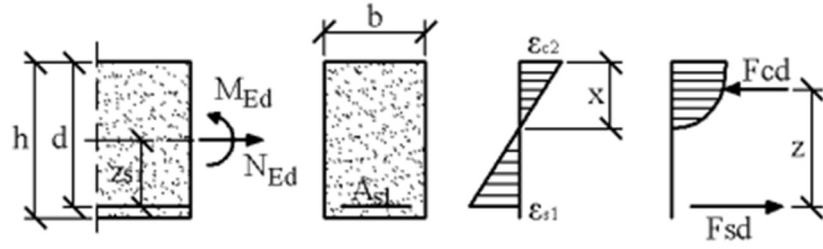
Dividing the beam cross-section into stretched and compressed zones
